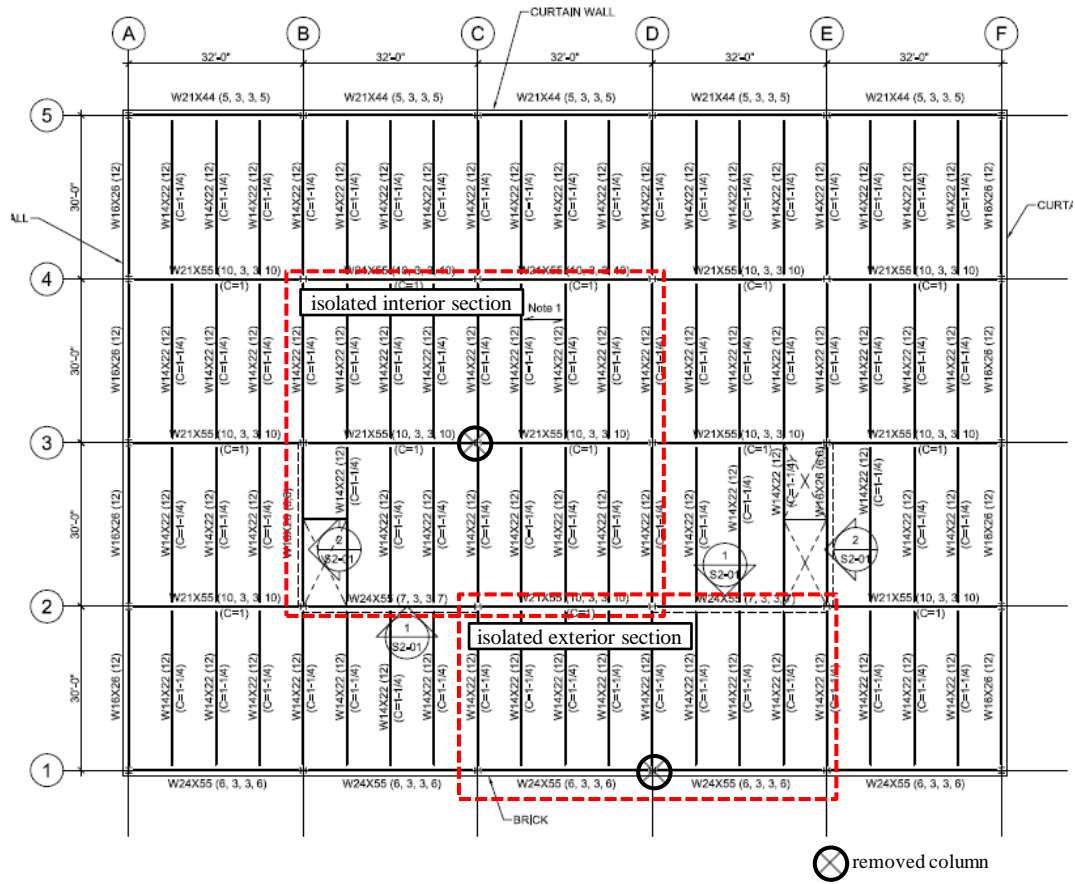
Typical floor plan of the prototype building representing locations for the isolated sections of the test specimens
